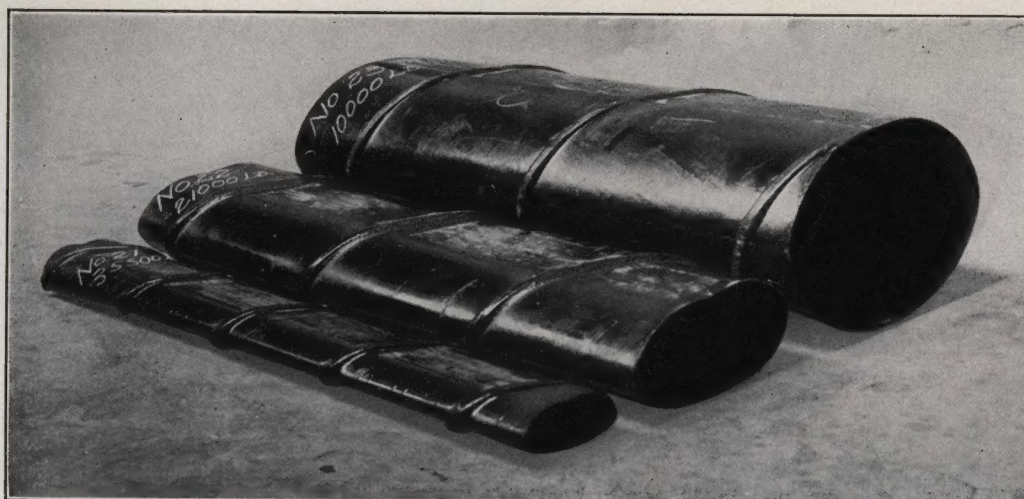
Specimens used in crushing tests on Naylor Spiralweld Toncan Iron Pipe, after testing.
